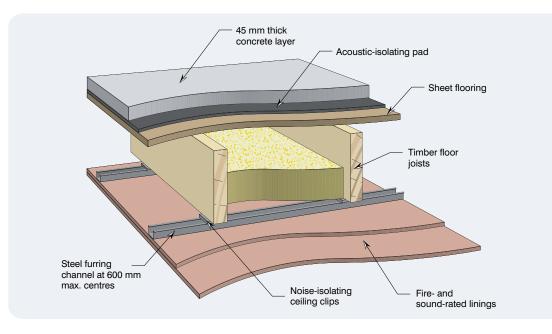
Adding mass to floor system through the use of concrete topping.
